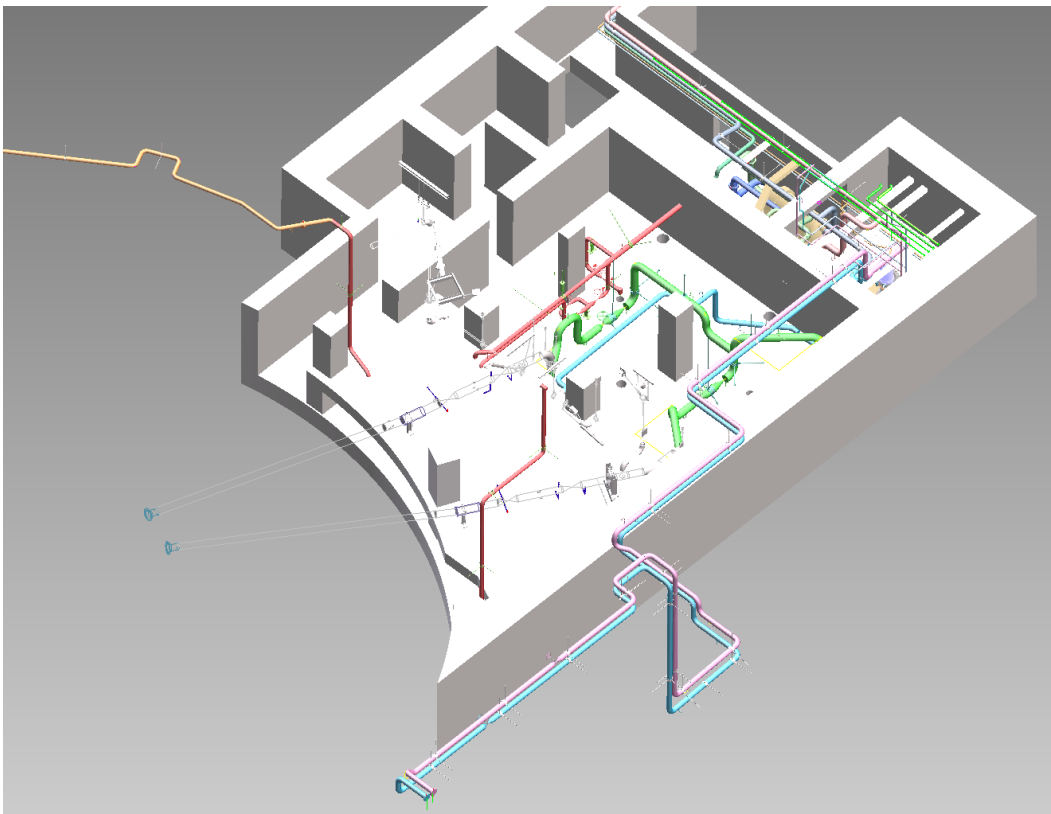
Ground plan of the AB el. 89, showing new piping and major equipment (PMP, HEX) – look from plant north-west side
